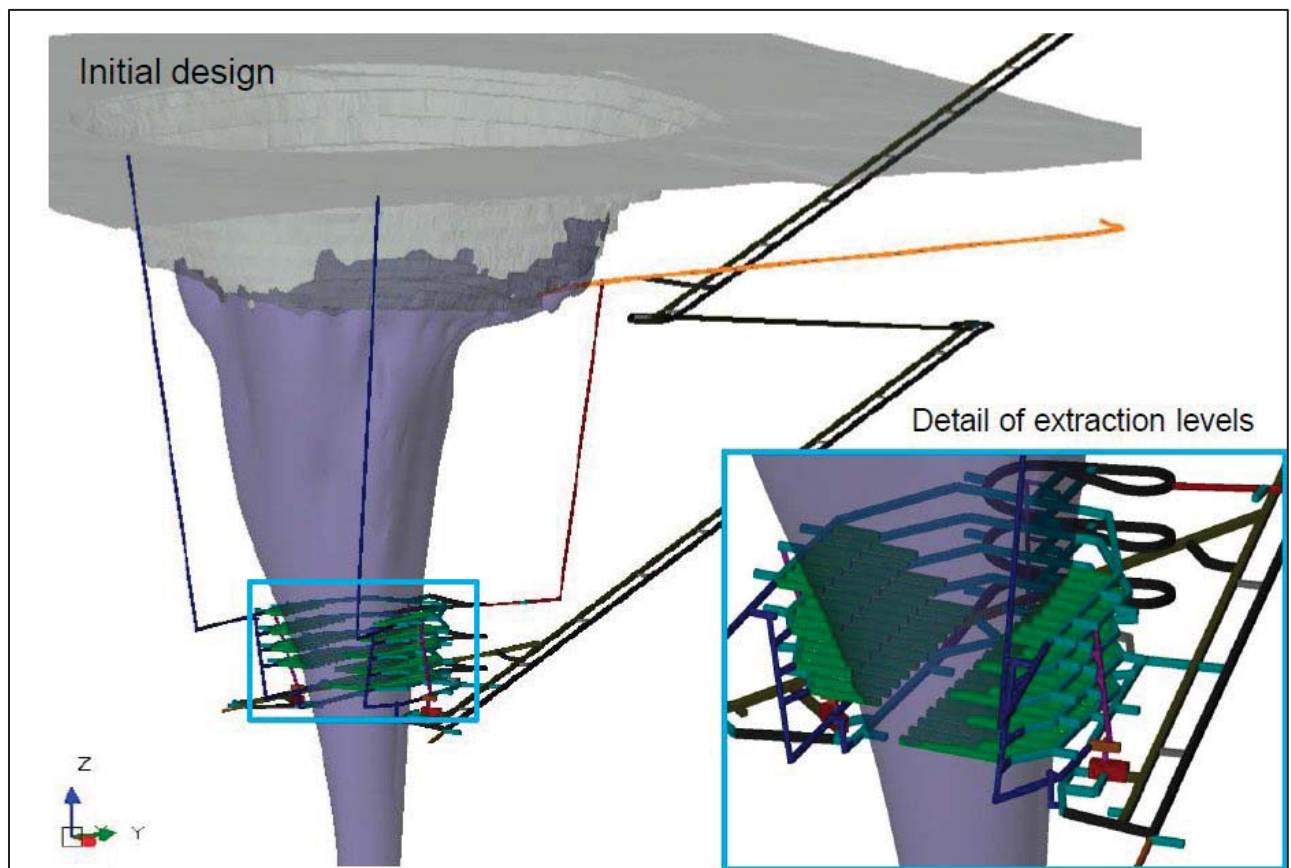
Conceptual layout of extraction levels for Fox Underground (incline cave method)
